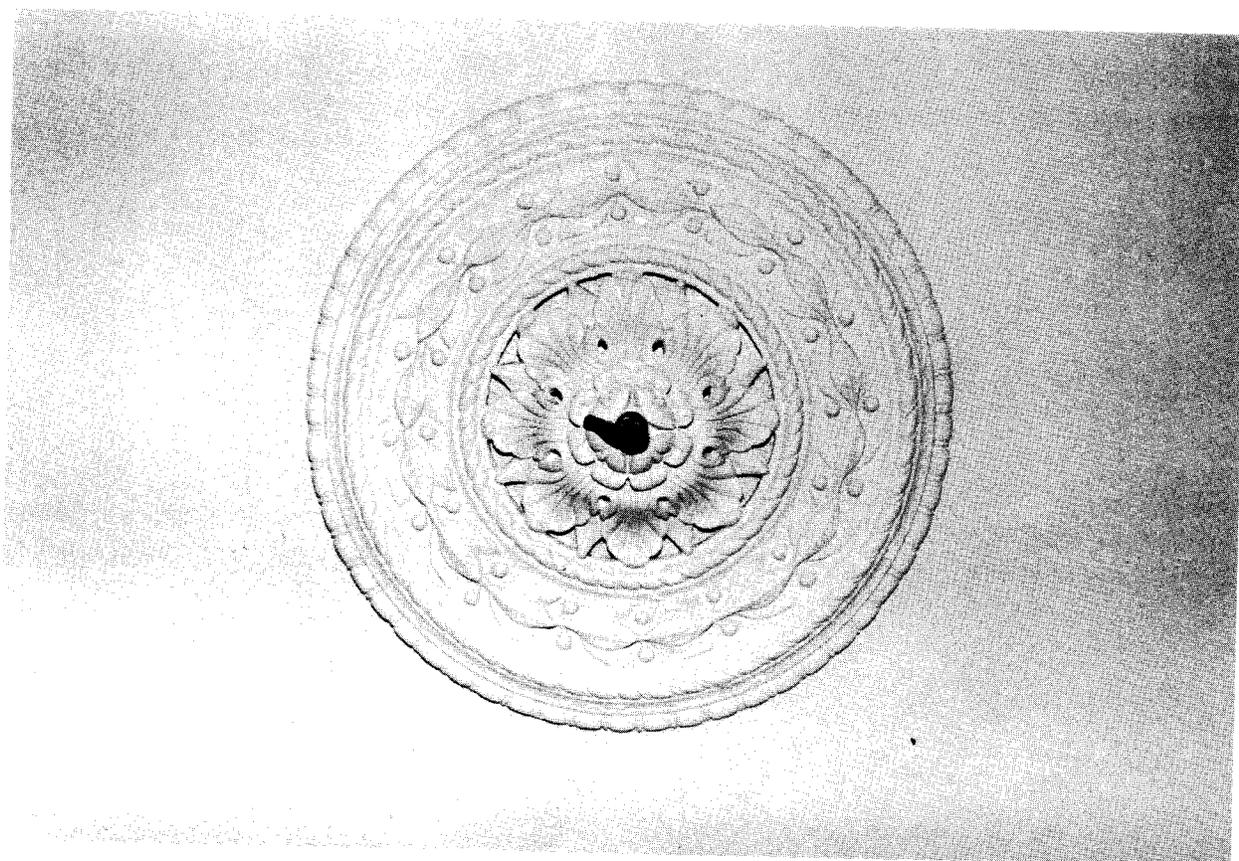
Penniman House: Southwest Parlor (Room 101), Cast-Plaster Ceiling Medallion (1984).
